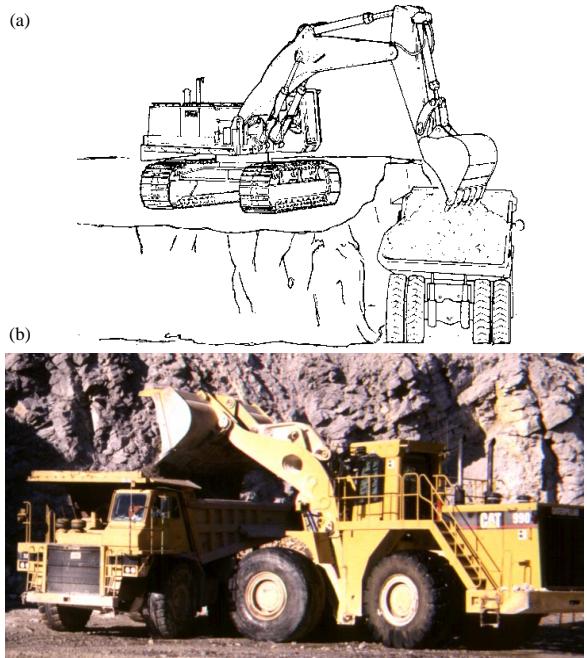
Truck loading with (a) an excavator backhoe and (b) a wheel loader. We have automated an excavator that performs “bench loading” as in (a).
